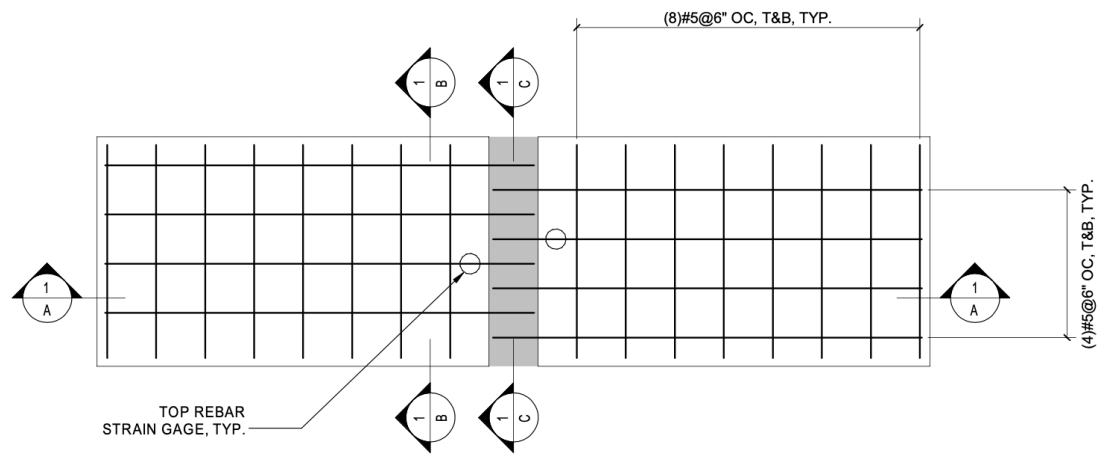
Plan view of a structural test specimen (2) 28 in. by 48 in. panels.
